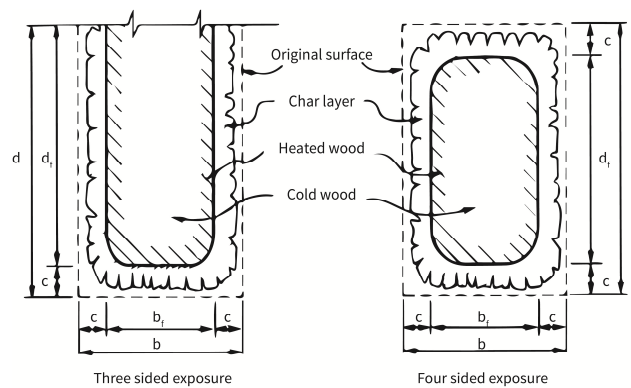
Design concept for heavy timber exposed to fire. Adapted from Buchanan (2009).
